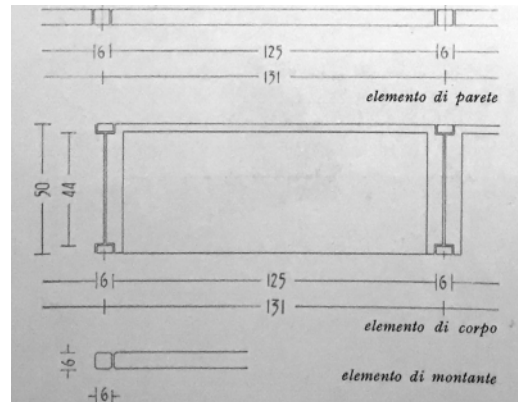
The module of the system (131 cm) corresponded to the width of a wall element (125 cm) plus the sum of two half uprights (each 3 cm wide)- Source: Garda houses catalogue.
